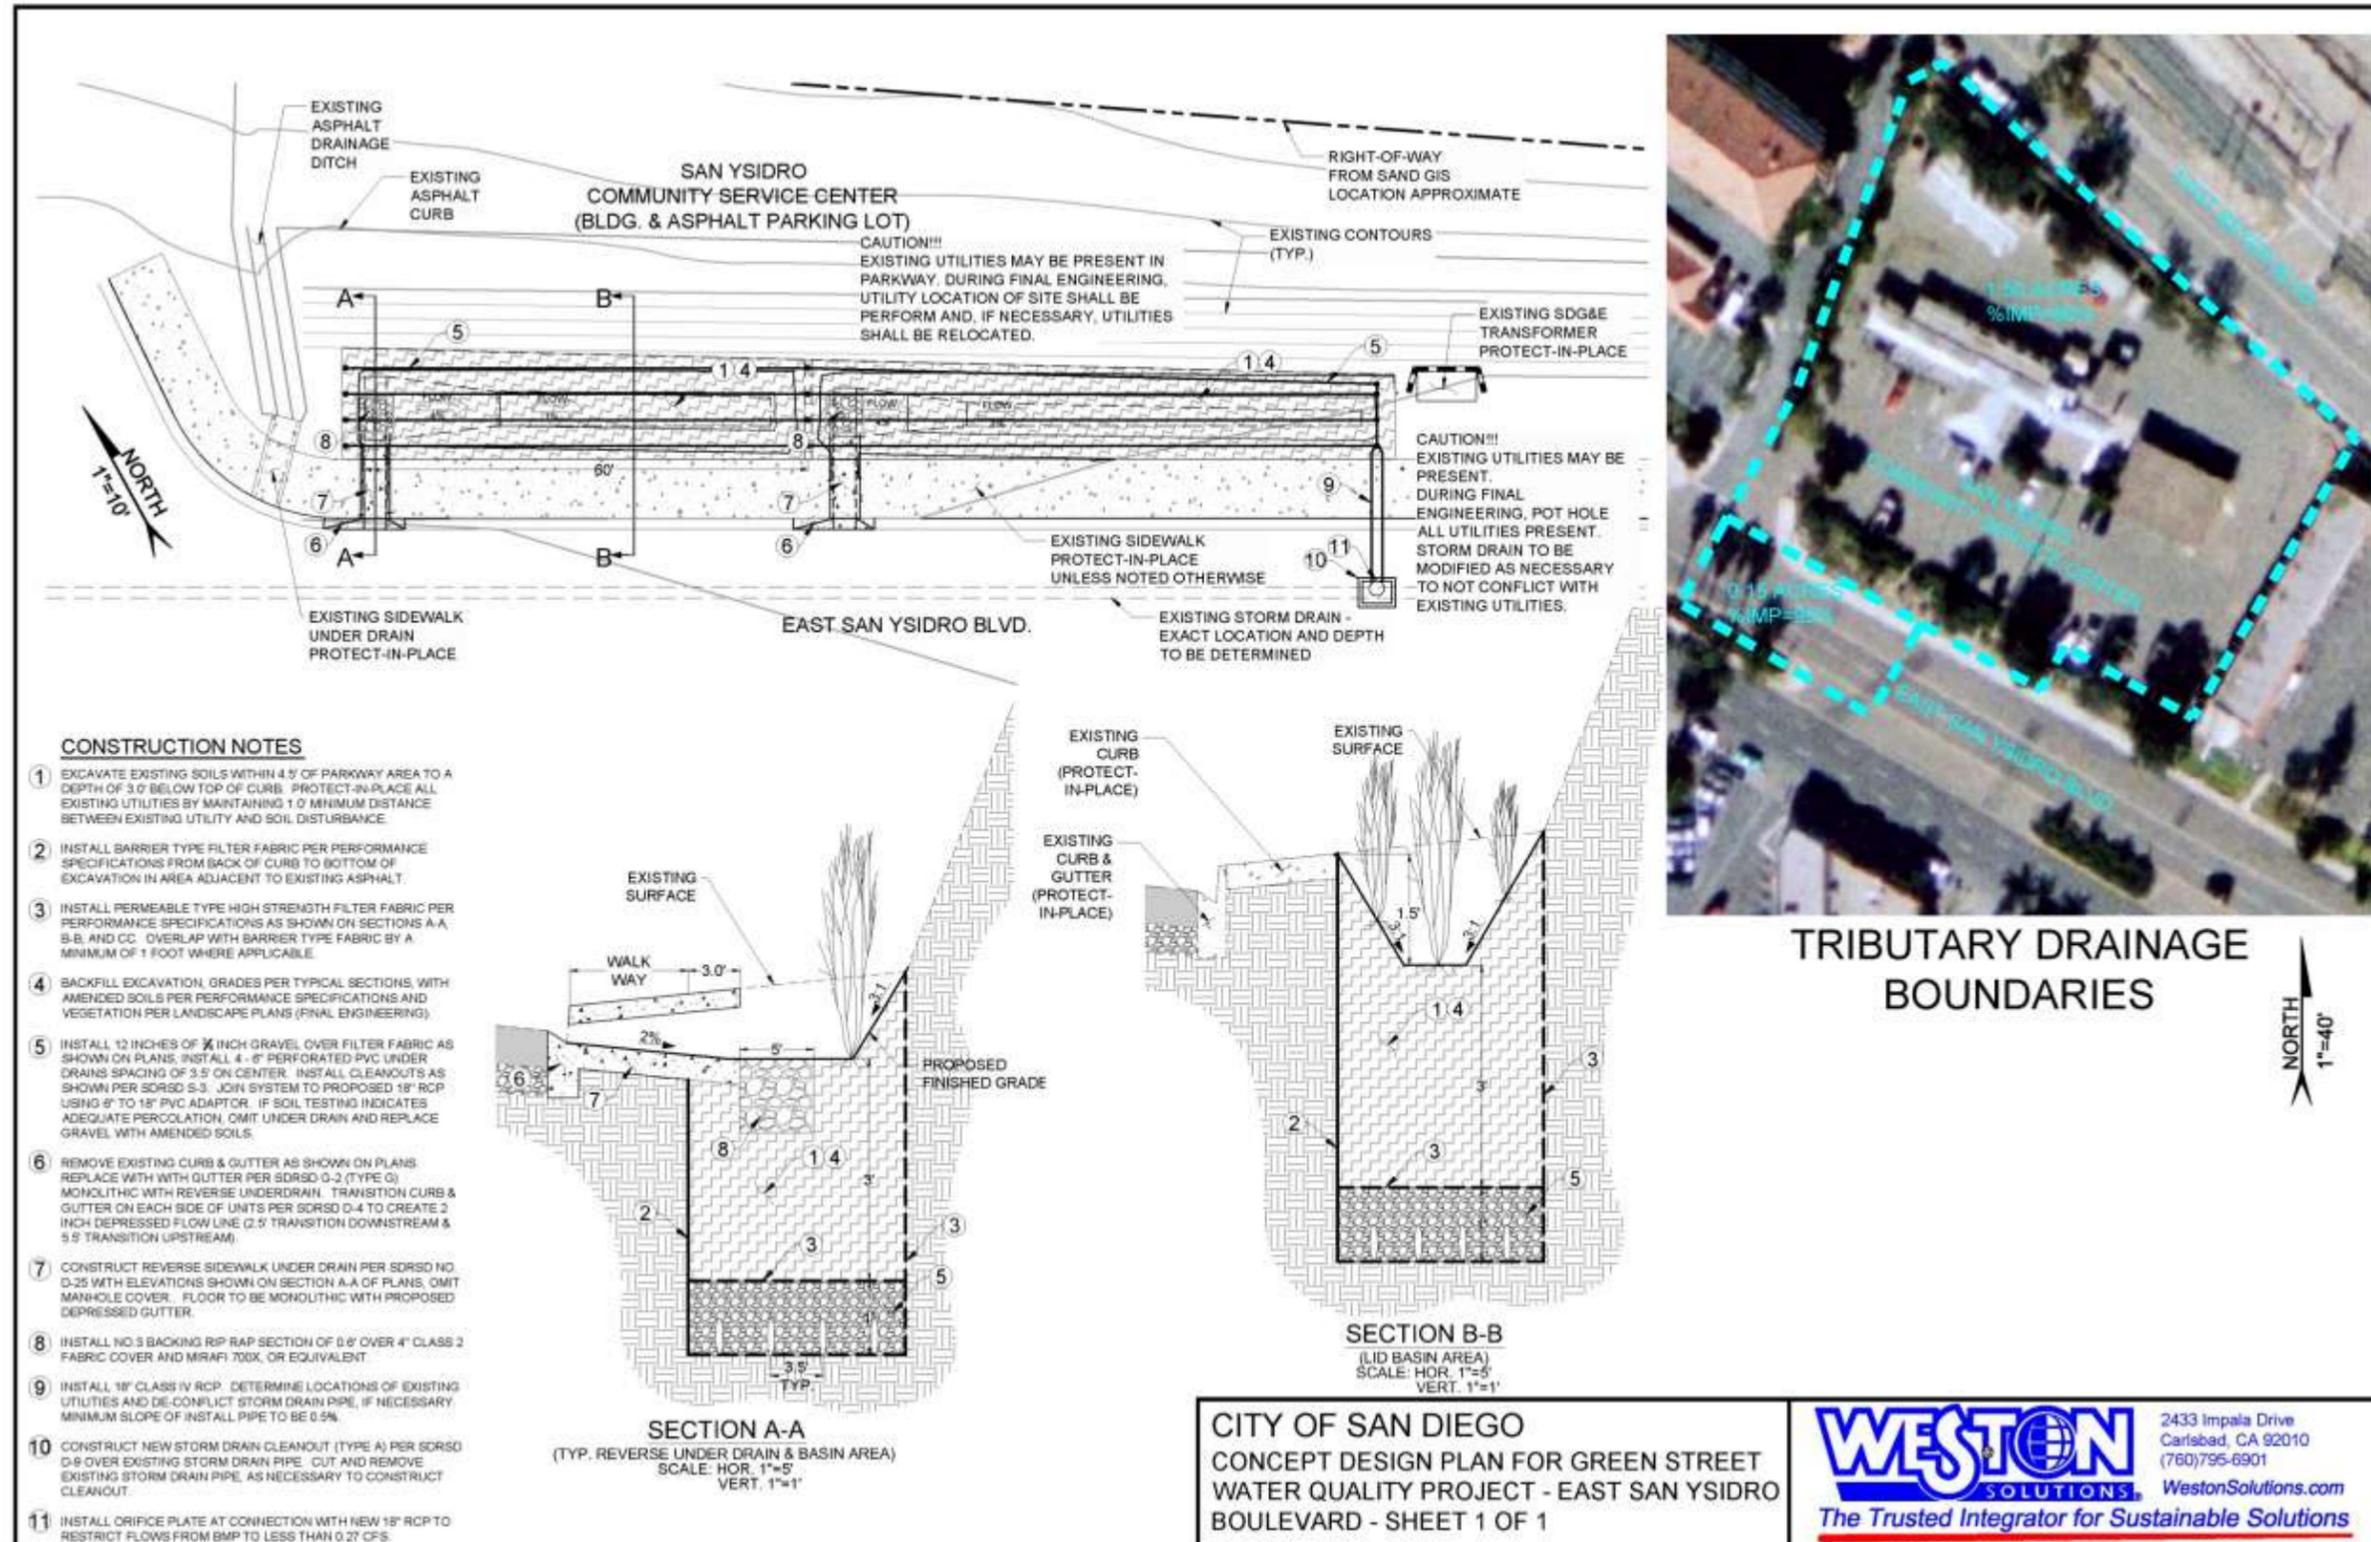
East San Ysidro Boulevard Bioretention Concept Design Plan
